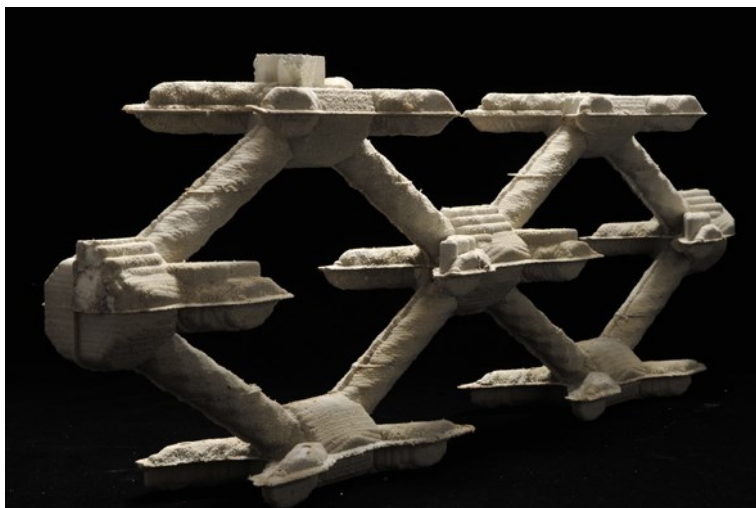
Prototype of steel fibre reinforced ultra-high performance concrete lattice by Melika Aljukic, 2016. The prototype is a collection at the Institute for Lightweight Structures and Conceptual Design in Stuttgart.
